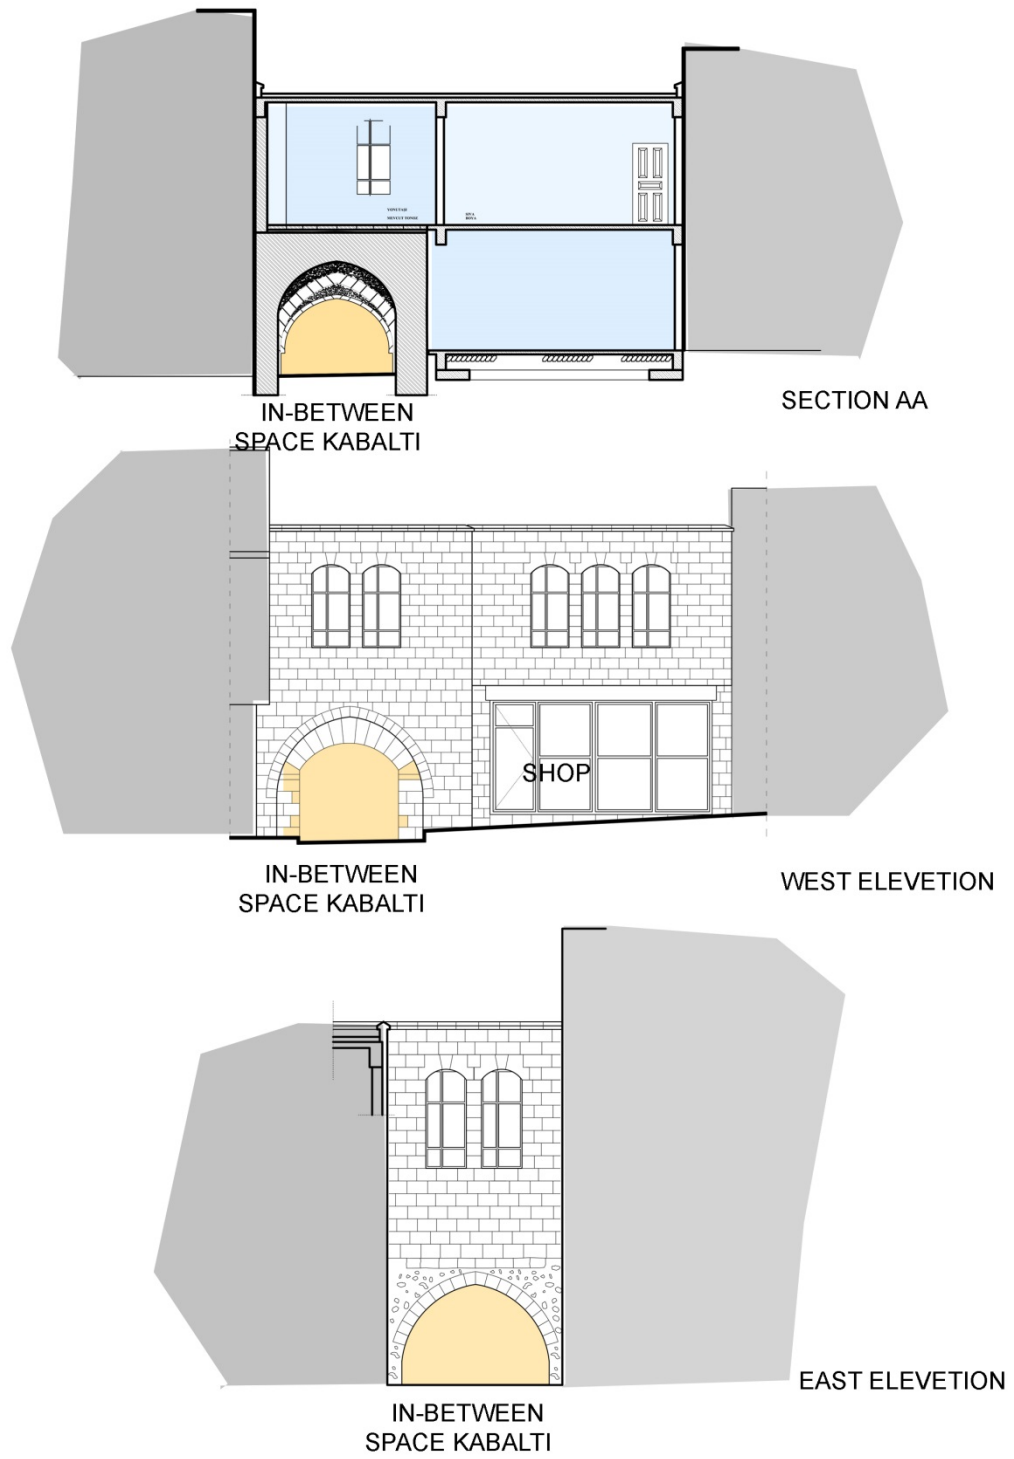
The sections and elevations of Salih Avcı Kabatis House
